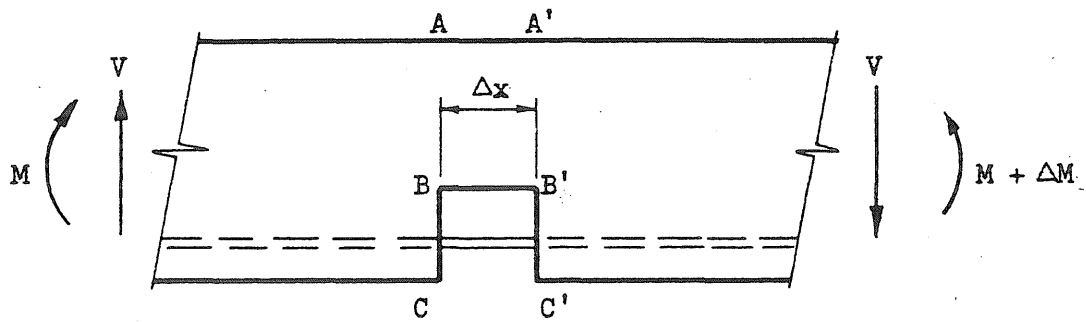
EFFECT OF STIRRUPS ON APPARENT TENSILE STRENGTH OF CONCRETE
